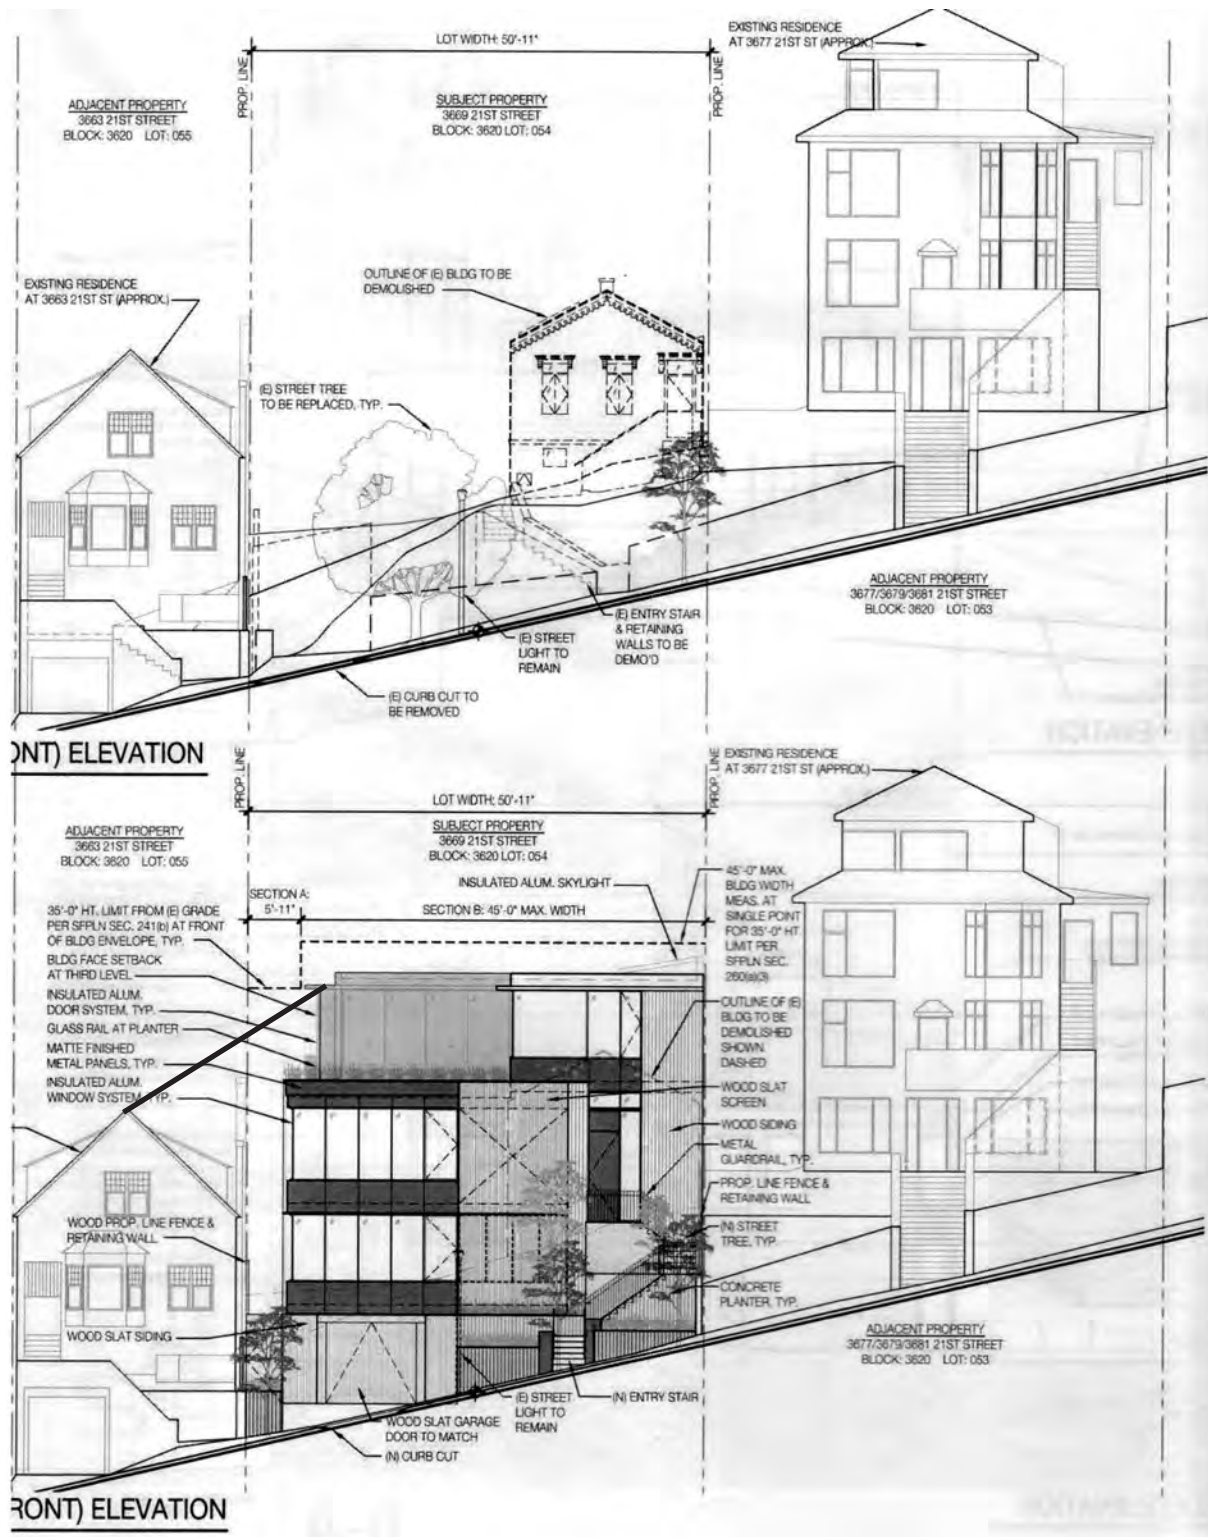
, detail of 3669 21st Street proposed site plan front elevation, sheet A-5, with superimposed line showing roof-to-roof relative position and potential shading.
